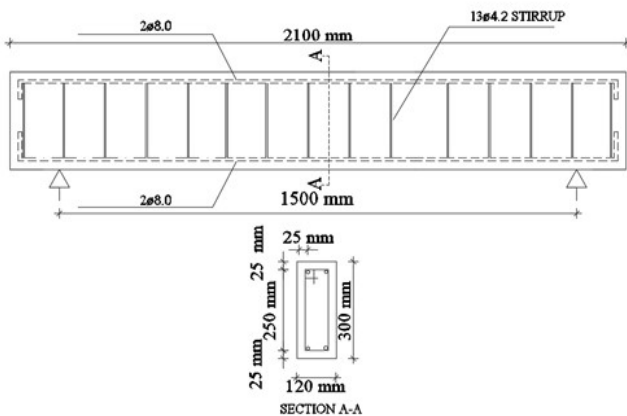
Concrete beams geometry and reinforcement details. Source: Authors
